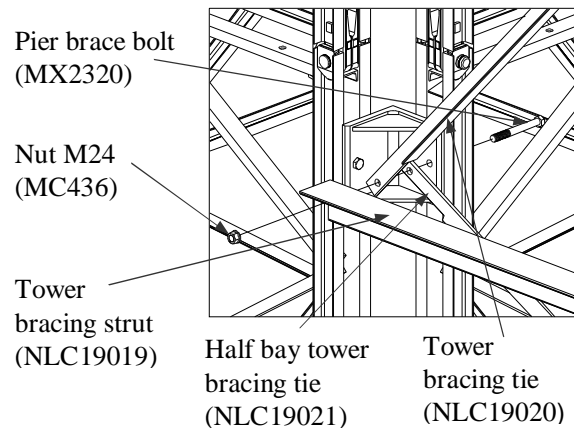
Tower bracing ties, tower bracing strut and angle bracket connection.
